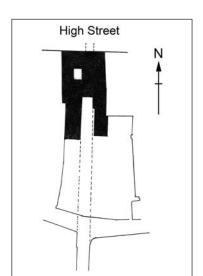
Plan showing late 19th-century layout of The Red Lion, 43 High Street (corpus no. 32) (not to scale). The line of Lion Walk, between the High Street and Culver Street, is dotted
